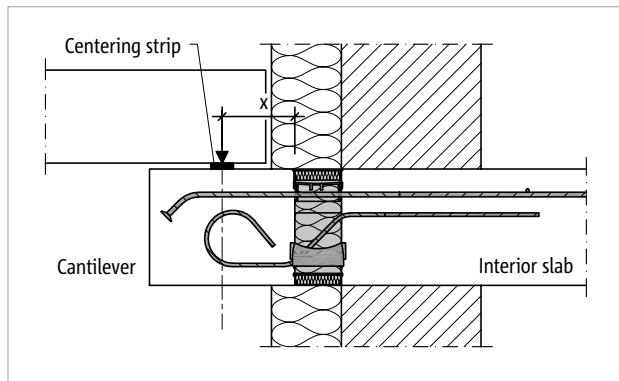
Schöck Isokorb® T Type CO: Connection of a console as floor support; centring battens prevent a displacement of the load application point
